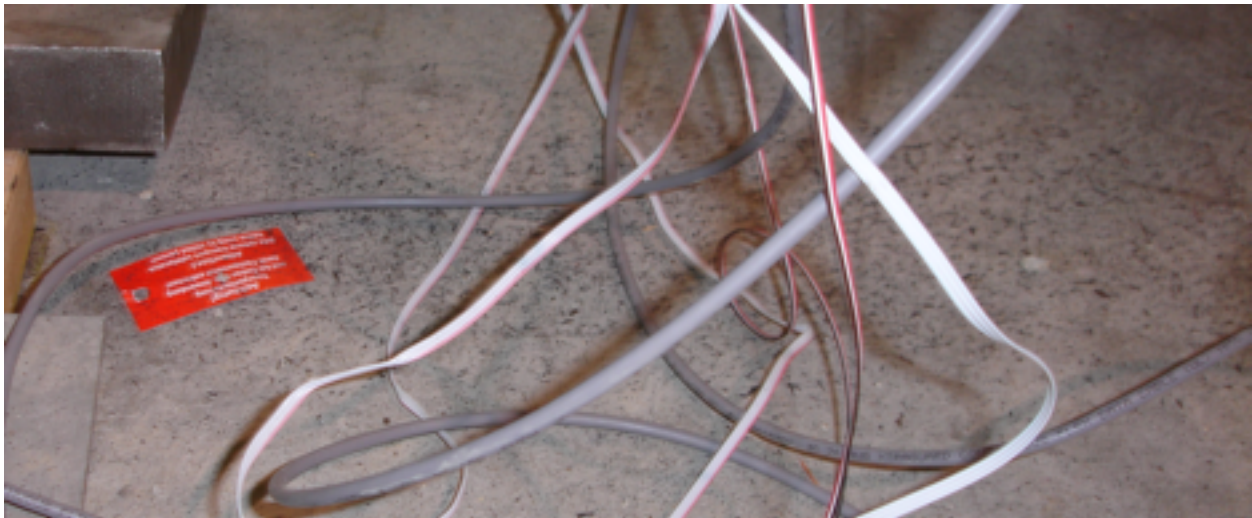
Flakes of surface material from the steel section accumulating under the specimen
